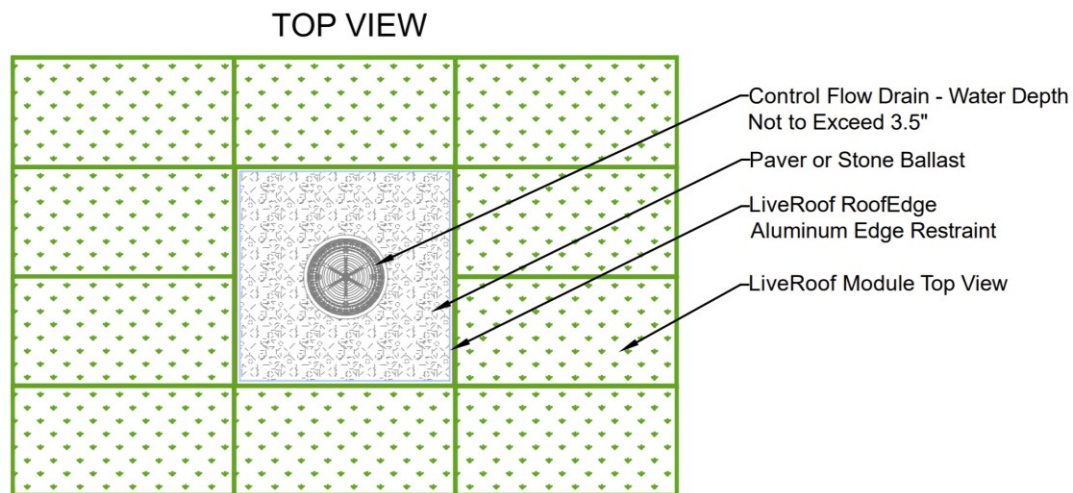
LiveRoof Blue-Green Module Plan View (“Blue Green Roof Solutions” 2025)
